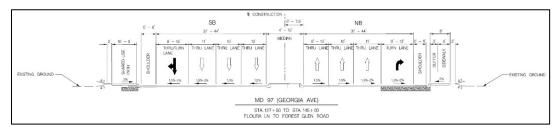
Proposed Typical Cross Section – Flora Lane to Forest Glen Road
